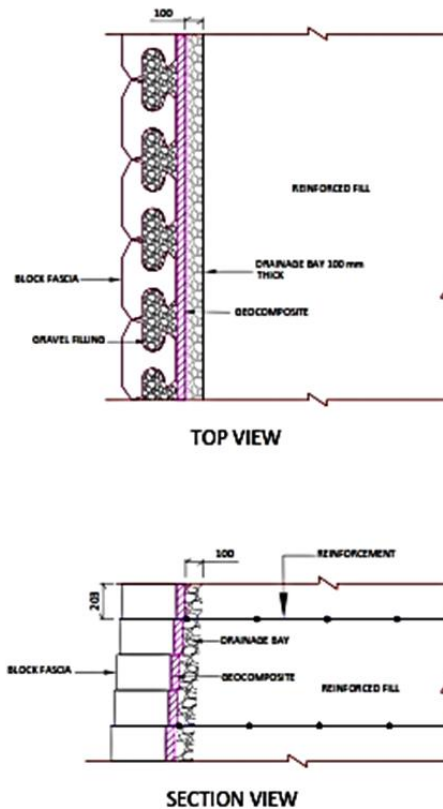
Typical detail of geonet as drainage bay behind a segmental concrete block fascia
